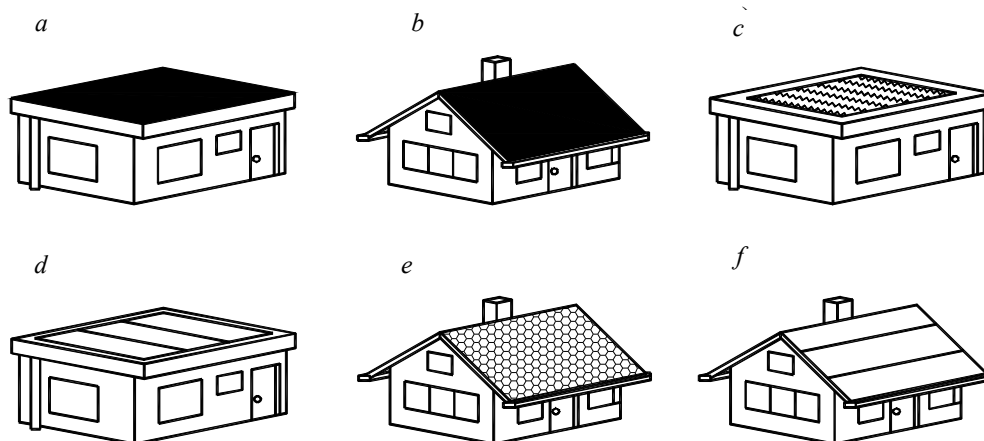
Types of roof with different flow coefficient Ψ_r : flat roof with plantings, $\Psi_r = 0.2$ (a); sloped roof with plantings, $\Psi_r = 0.25$ (b); flat roof with grit, $\Psi_r = 0.6$ (c); flat concrete roof, $\Psi_r = 0.7$ (d); sloped tiling roof, $\Psi_r = 0.75$ (e); sloped concrete roof, $\Psi_r = 0.8$ (f)
